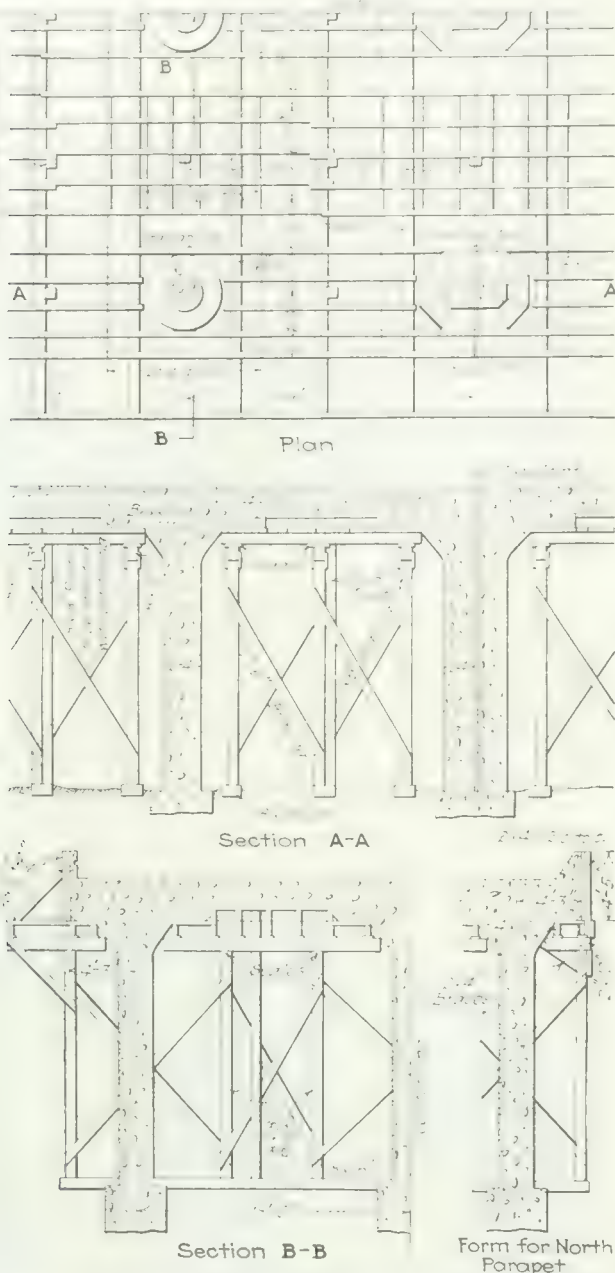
FORMS FOR VIADUCT SLAB AND PARAPETS
